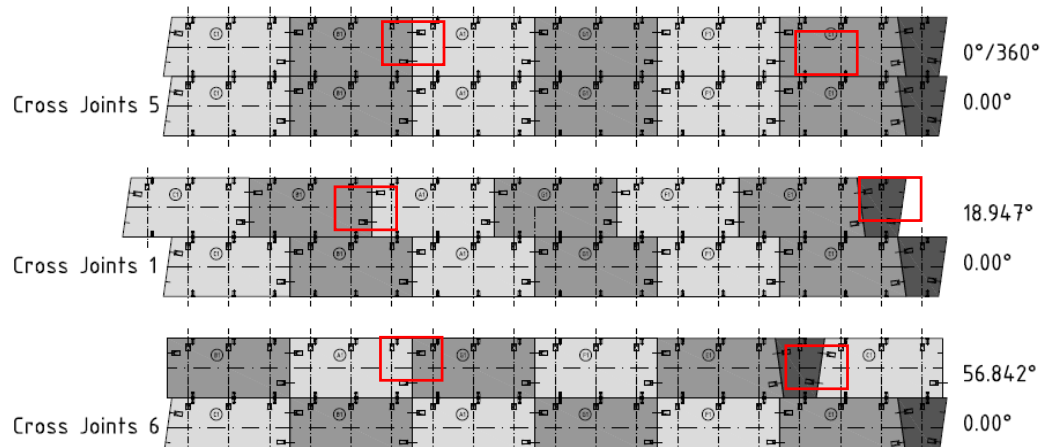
TBM tunnel not allowed rotations in rectangular precast segment. Cross Joint
